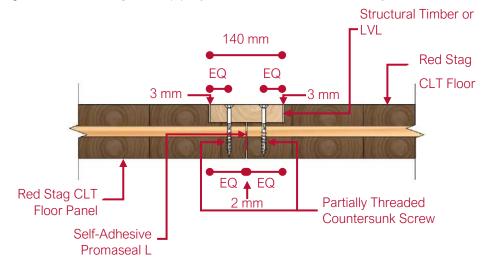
Red Stag three (3) layer CLT floor to floor with spline plate connection.
